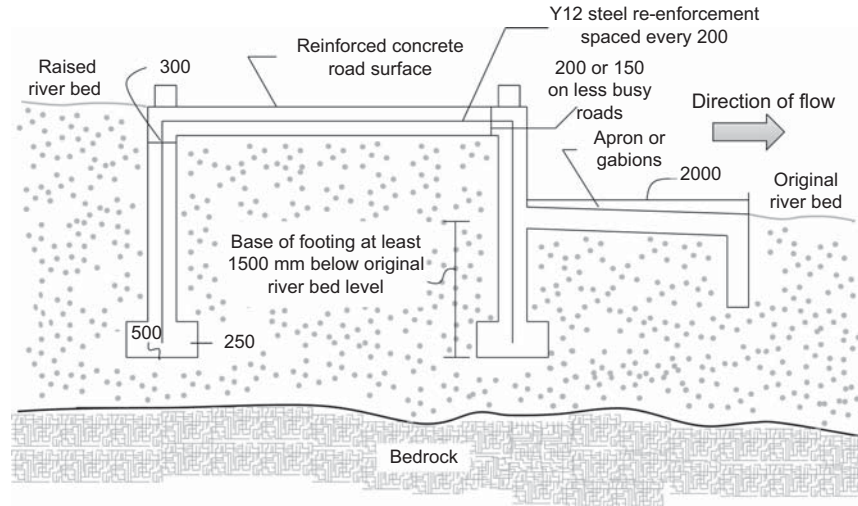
A cross-section of a raised drift crossing (based on Makueni Rural Roads Department guidance, dimensions in mm)
